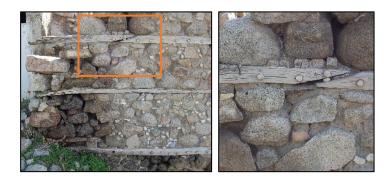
Timber lintels on the façade of stone masonry wall (left), connection of two pieces of timber lintel (right) (Camikebir N. b.block-lot: 198-11)
